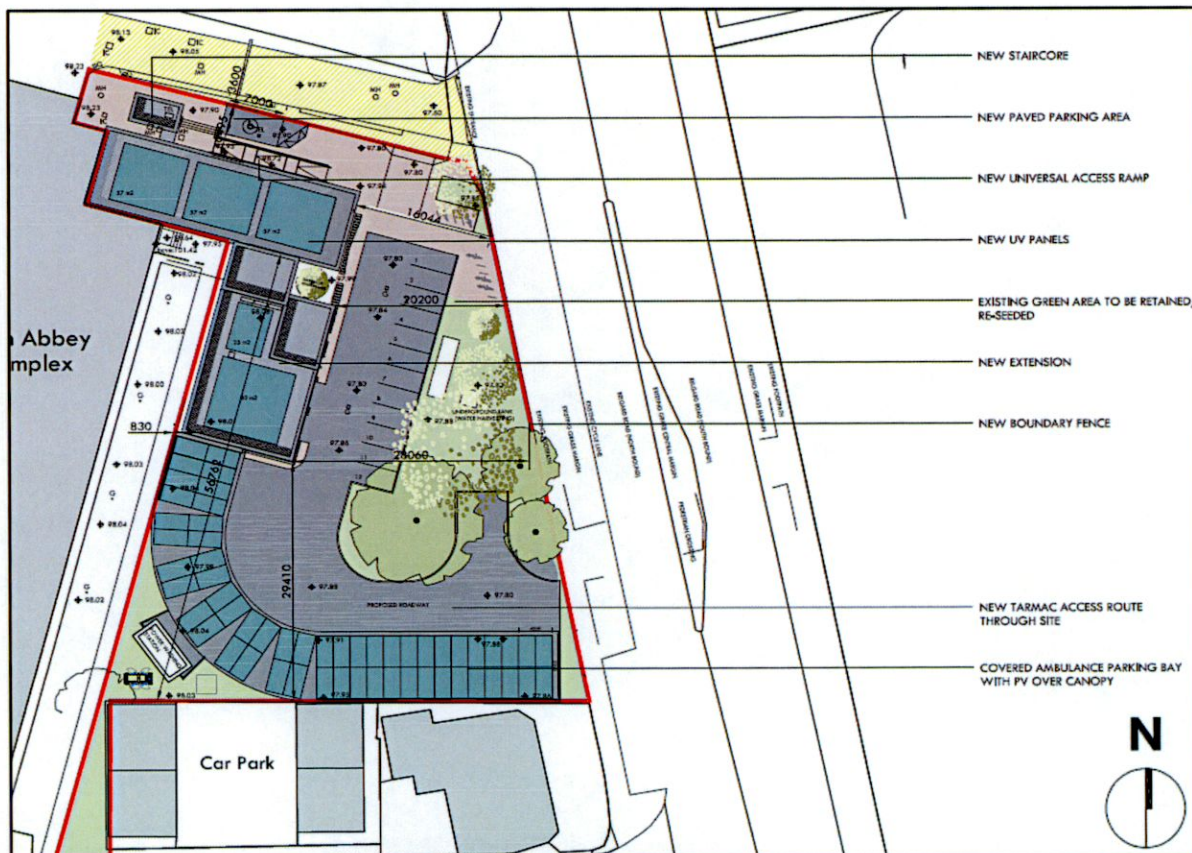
Proposed Site Plan for the HSE Ambulance Base
